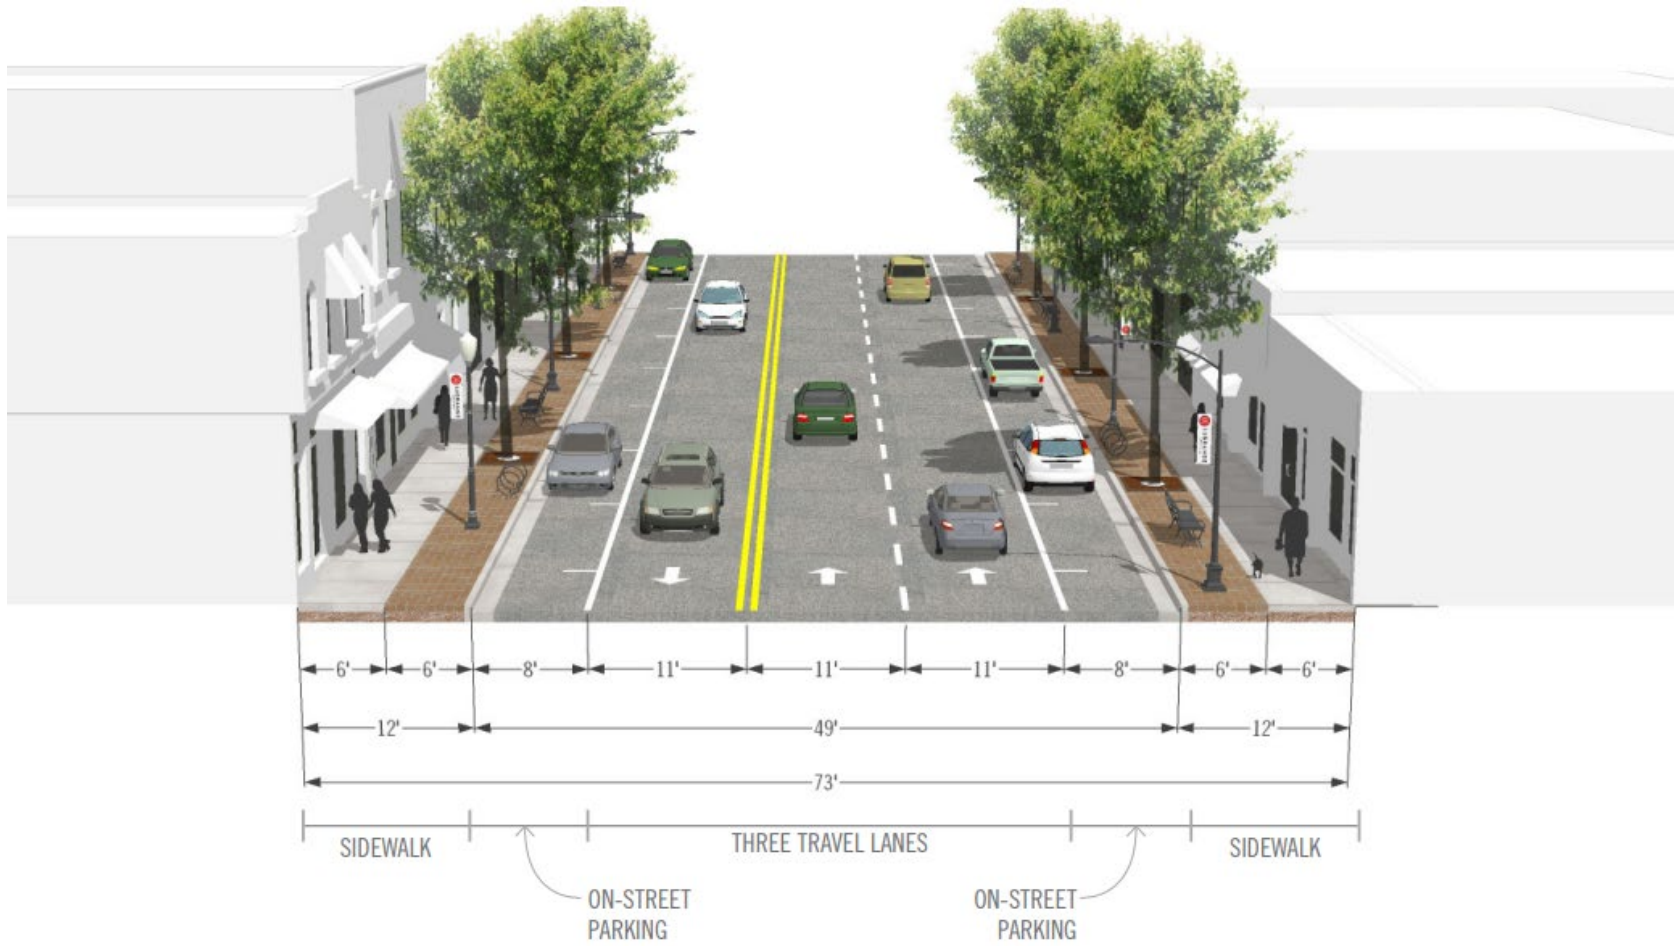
Recommendations for Lafayette Parkway in Downtown
